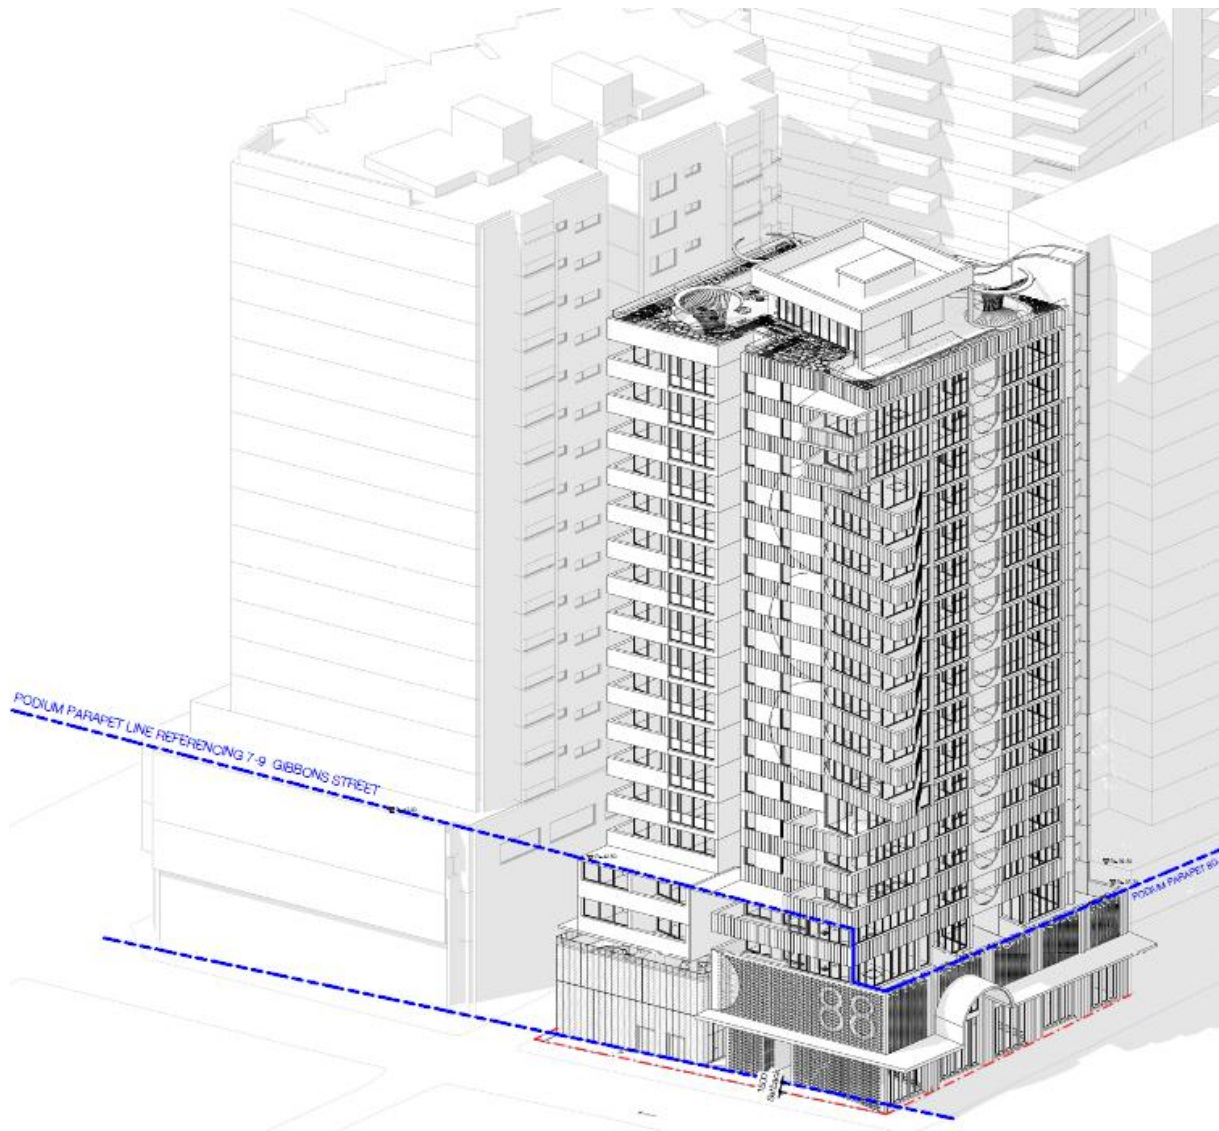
Amended tower setback and 4 storey podium to Marian Street
